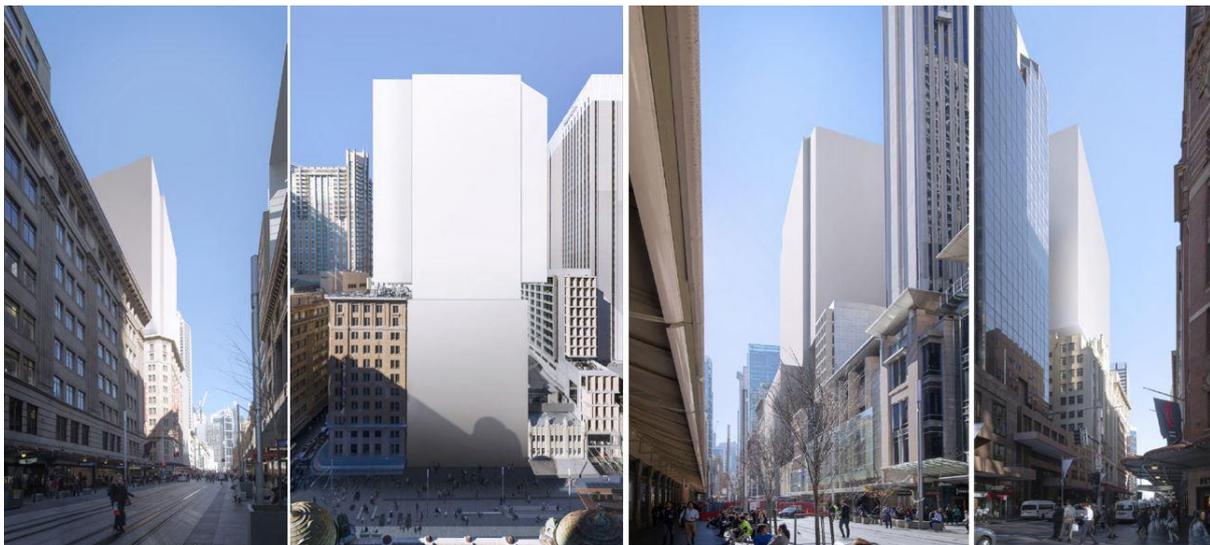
Photomontages of the building envelope proposed under development application D/2019/882, viewed from various locations along George Street and from above the QVB
